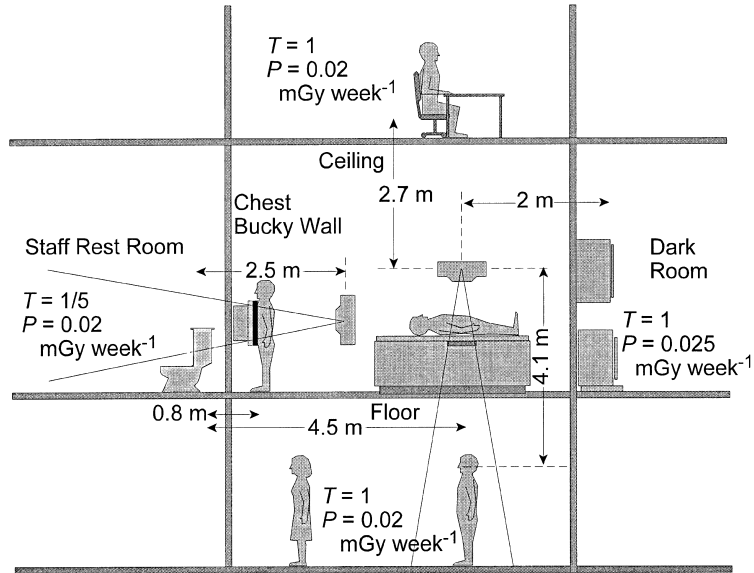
Elevation drawing of the radiographic room. The dimensions are used in sample calculations in Section 5.3. This same layout is also used for the R&F room examples in Section 5.4, with the addition of a fluoroscopy x-ray tube beneath the table and an image intensifier over the table.
